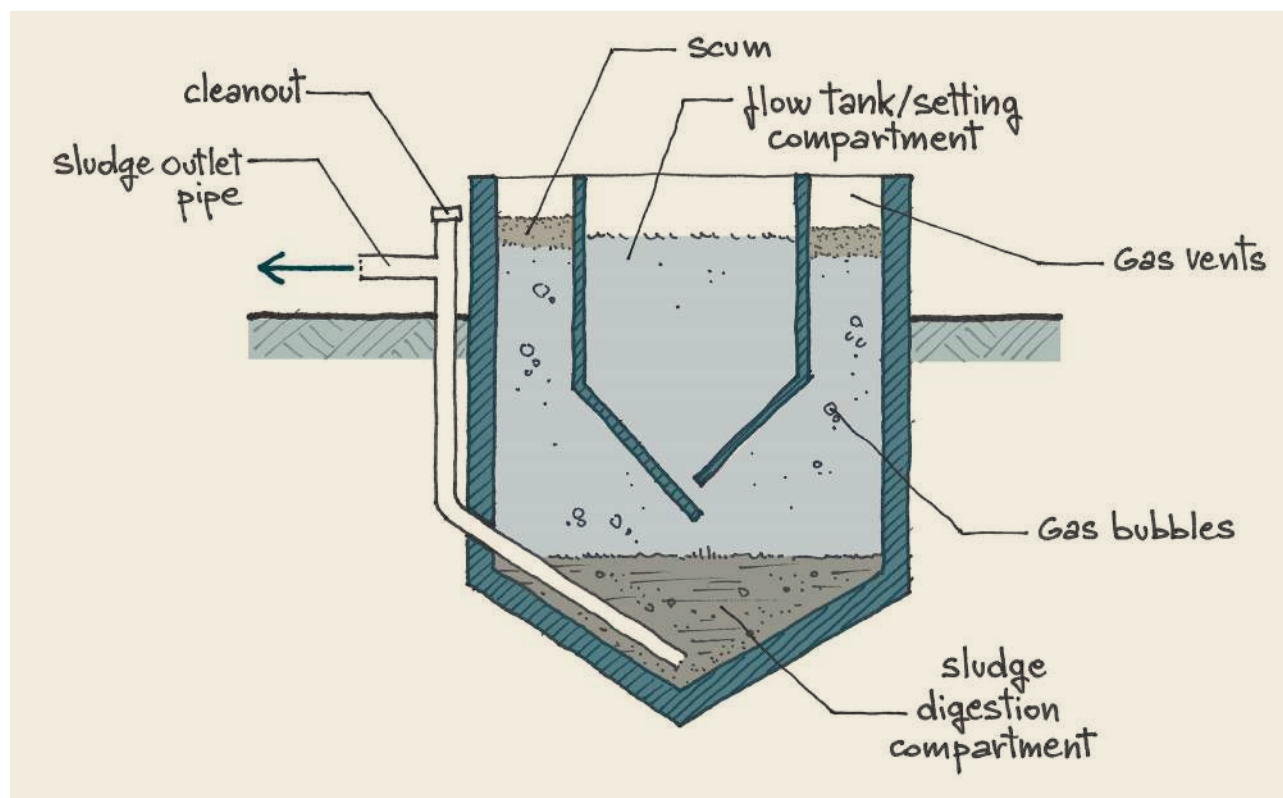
IMHOFF TANK - SCHEMATIC CROSS SECTION (ADAPTED FROM: TILLEY 2008)
